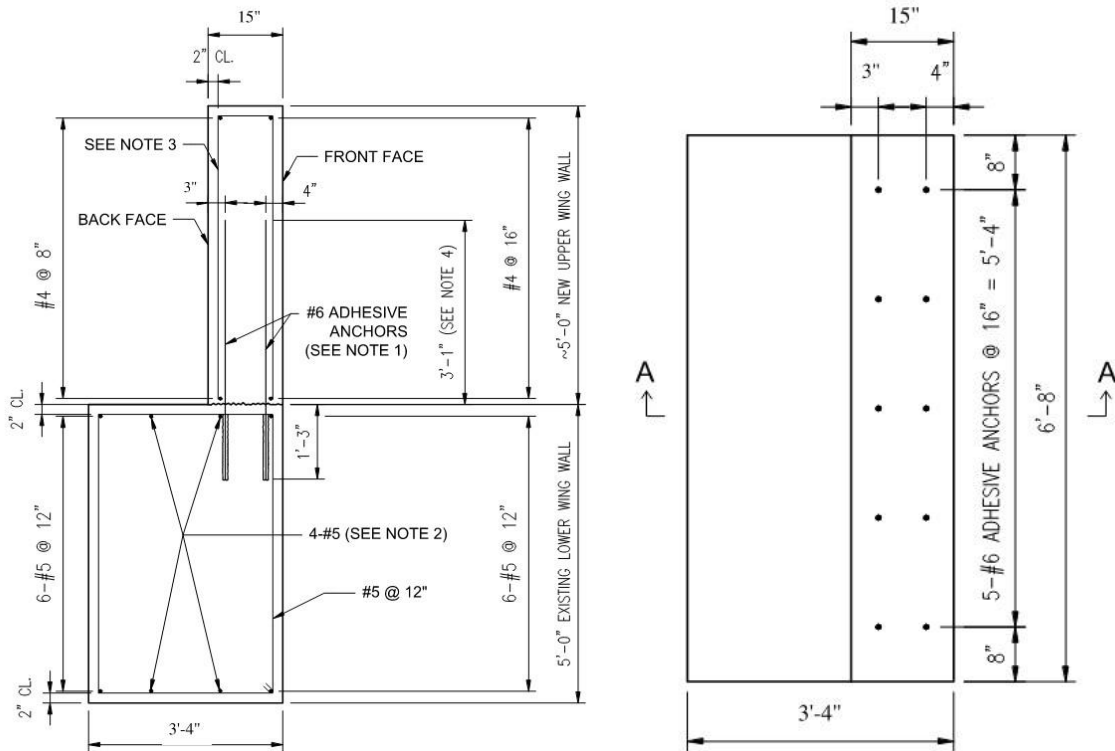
Elevation (left drawing) and plan view (right drawing) of wingwall test sample.
